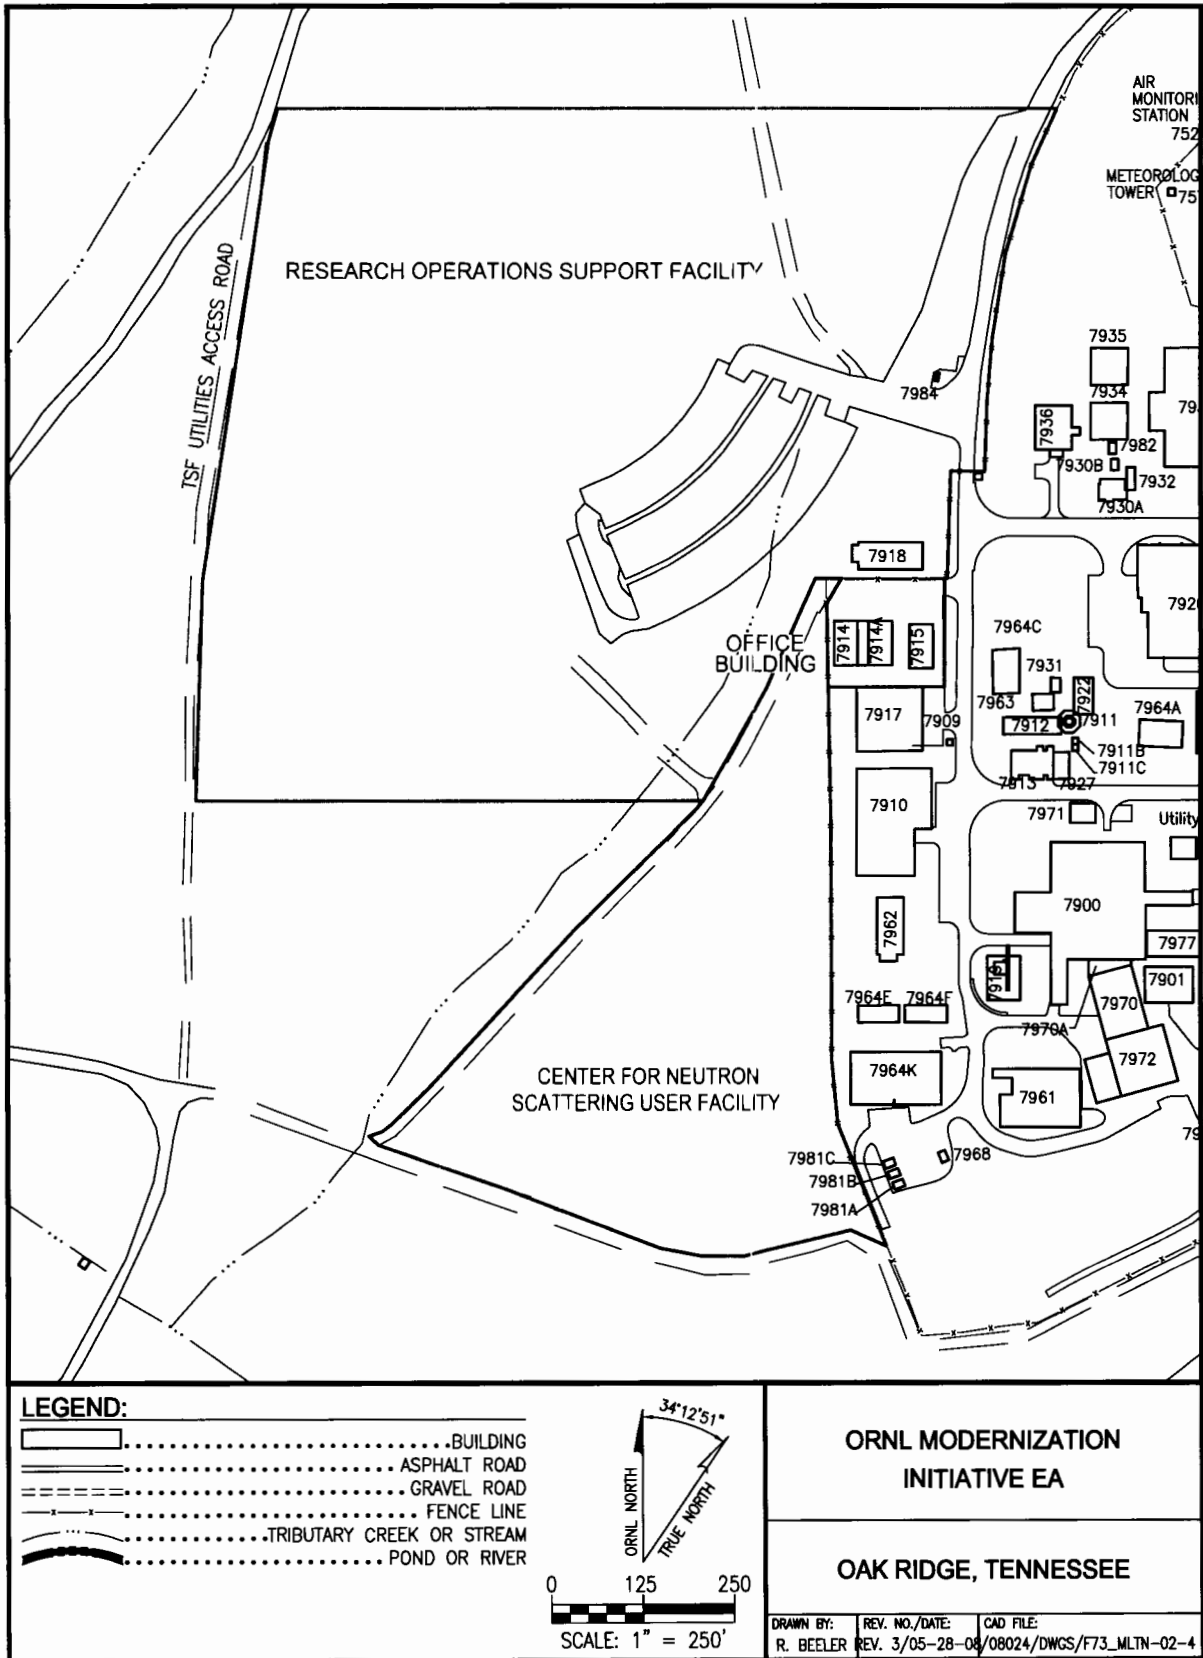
Location of the Melton Valley Office Building, Research Operations Support Facility, and Center for Neutron Scattering User Facility.
